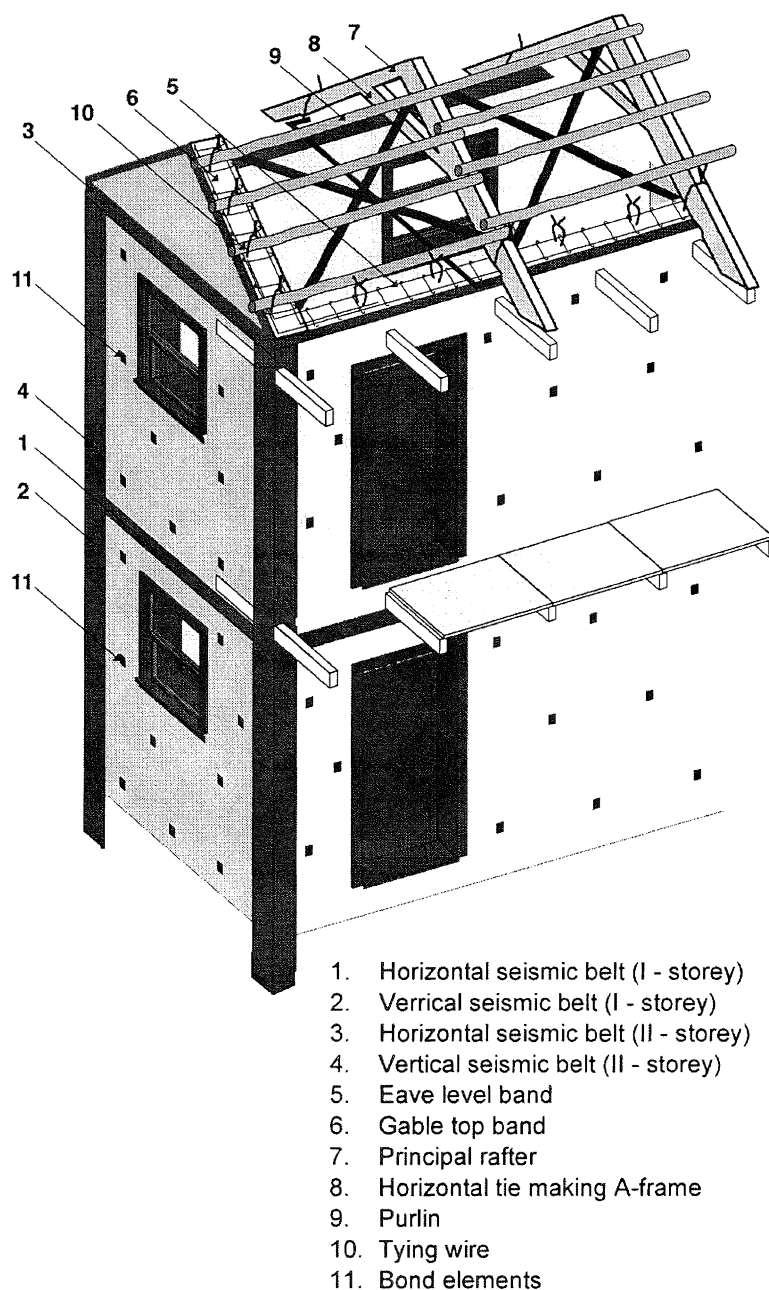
Overall retrofitting arrangement for 2-storey stone houses
